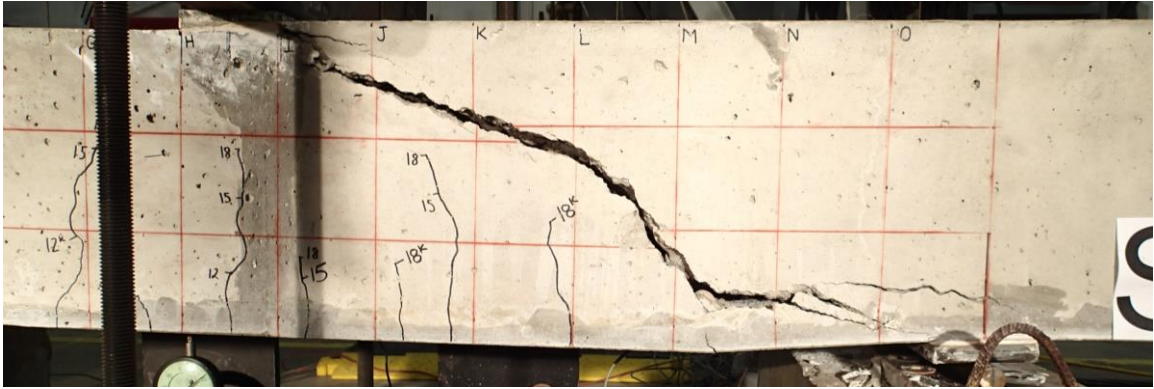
Specimen K-2: South Side Failure Inclined Crack
